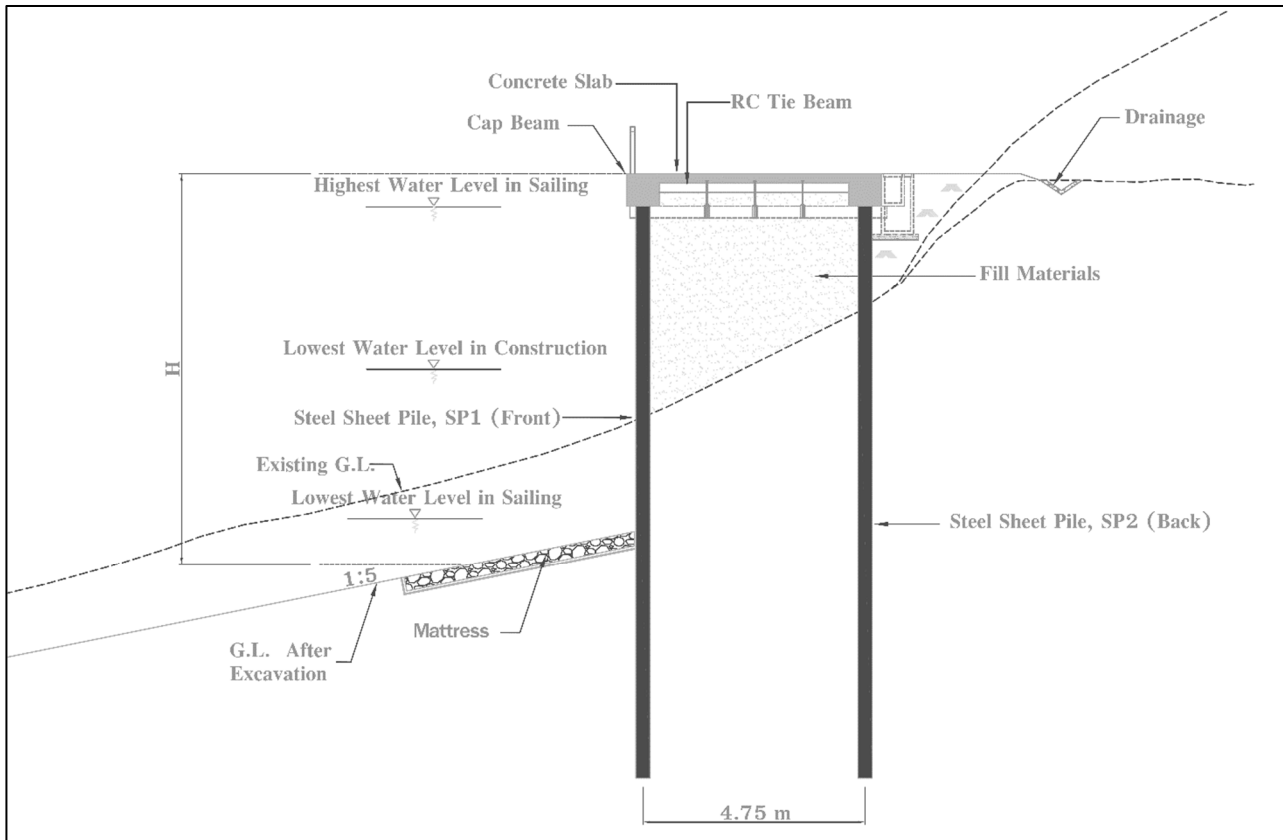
Typical cross-section of the double hat-type sheet pile revetment
